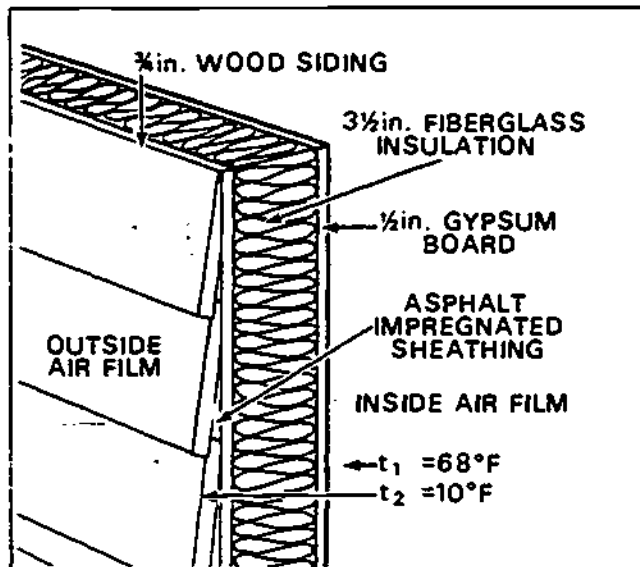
Sketch of wall section for conduction heat flow through a composite wall.
